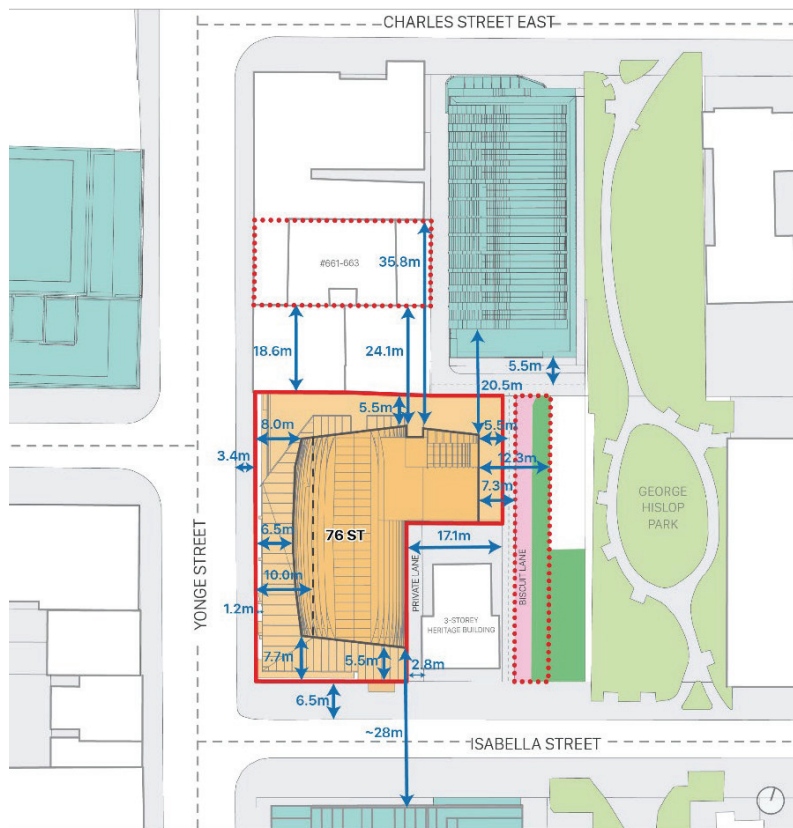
639-653 Yonge Street Block Plan, Source: Bousfield Inc.
